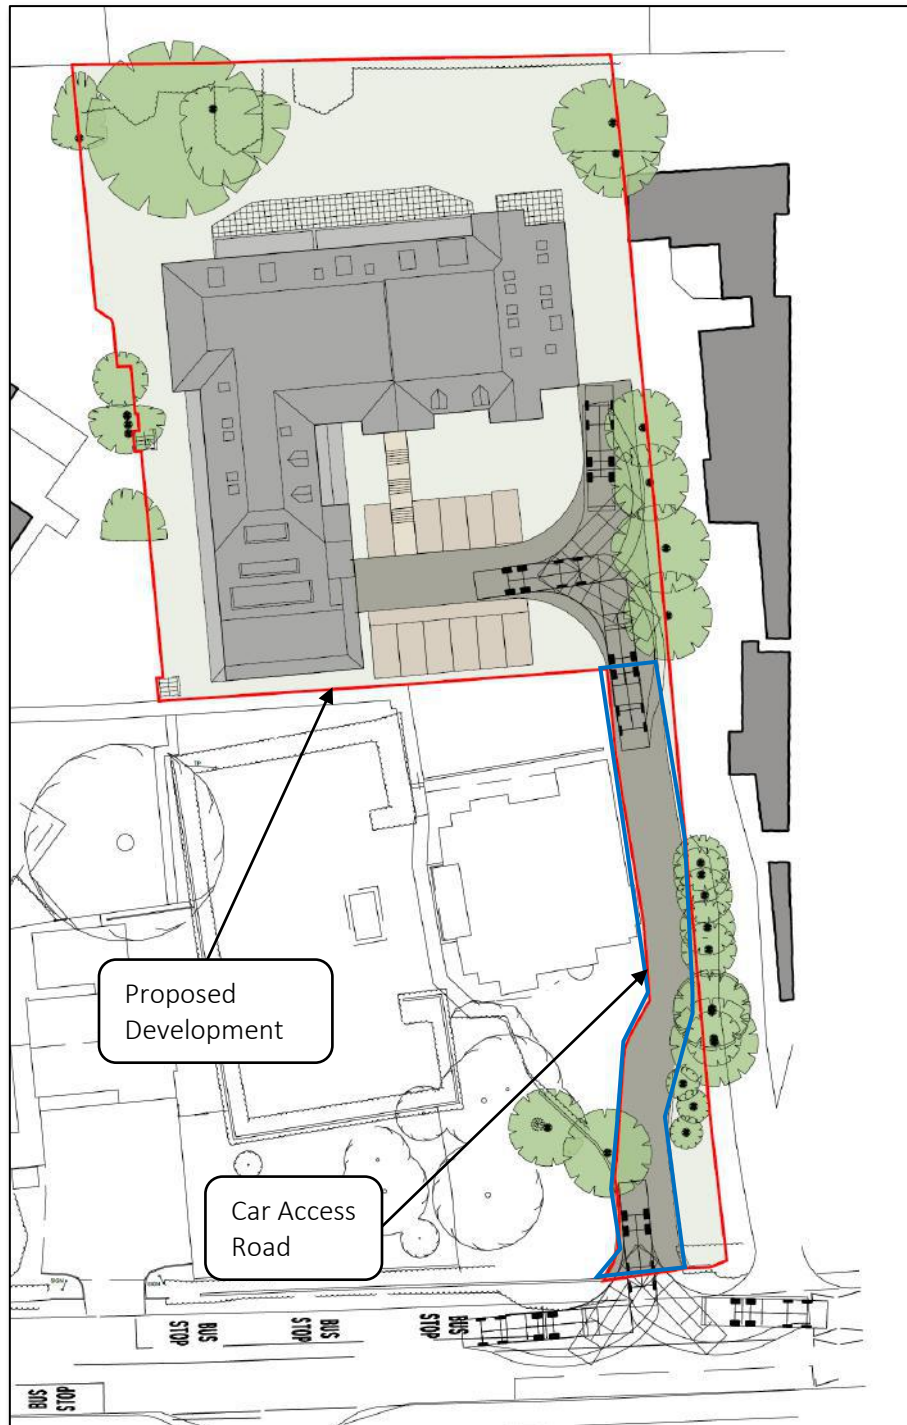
Extract of Appendix 1, Plan 5 – Proposed Site Layout.
